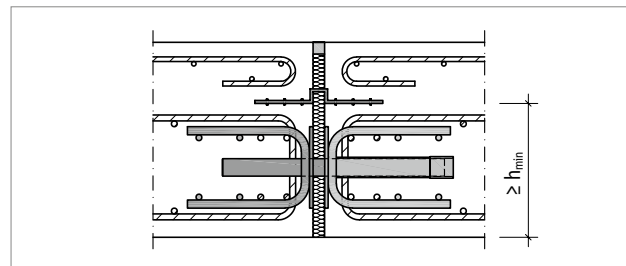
Schöck Stacon® type SLD: Expansion joint with joint tape
